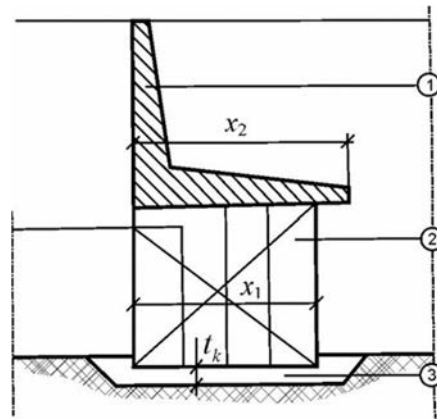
Estimated diagram: 1 – superstructure (monolithic or precast concrete); 2 – underwater part (massive laying); 3 – base (stone bed).
